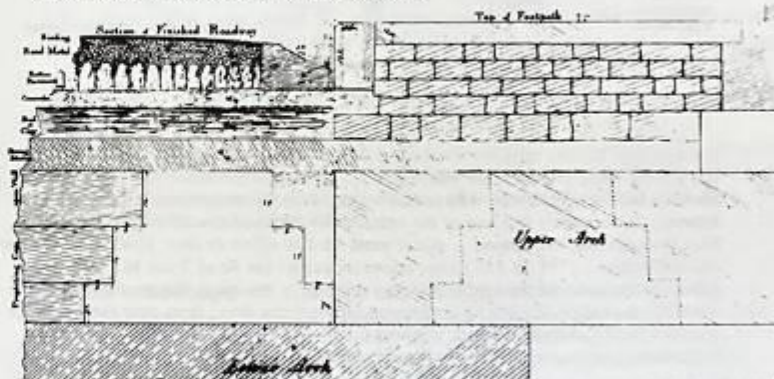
Dean Bridge—Proposed roadway construction, 8 May, 1829.<sup>9</sup>
